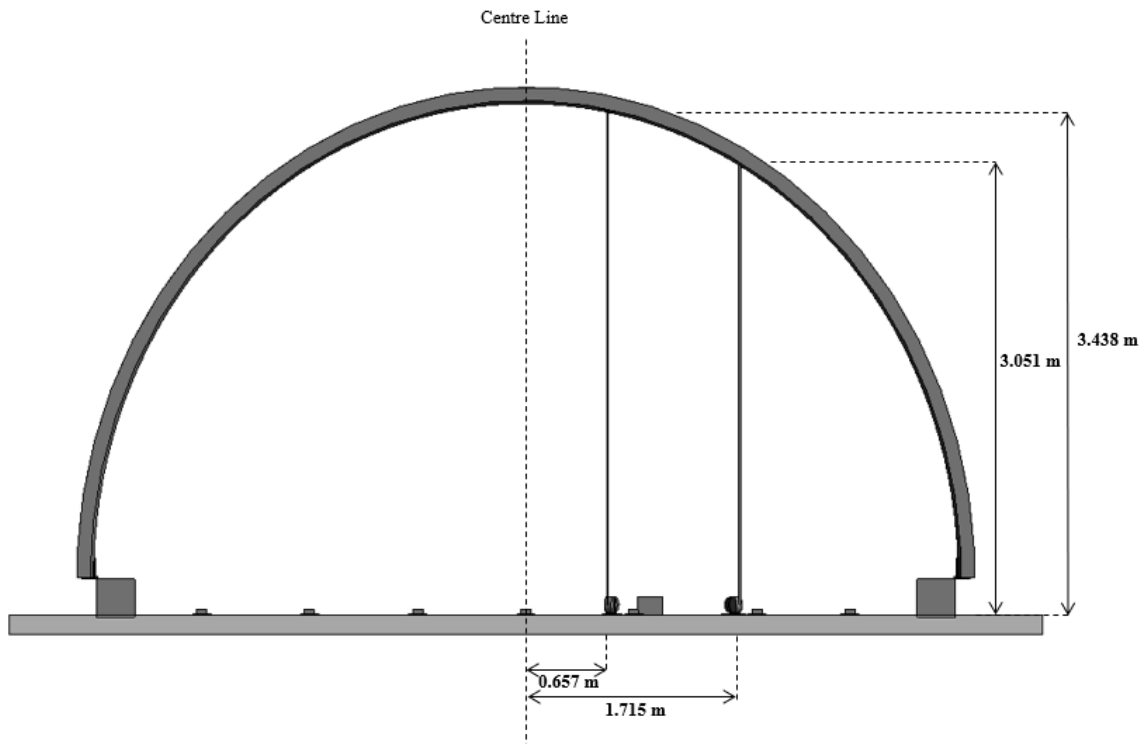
Side View Dimensions for Unbalanced Loading Pattern
